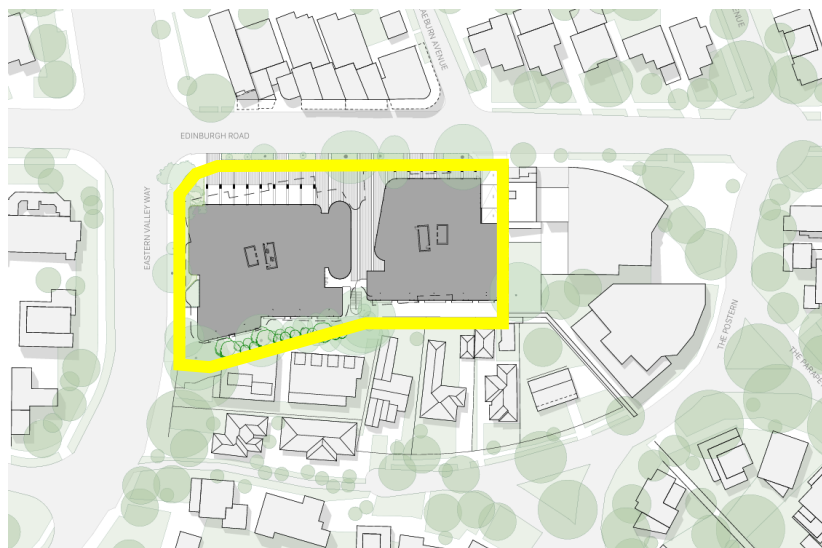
Indicative site plan outlined yellow demonstrating maximum of 2 buildings (Source: FJC/PPUD)
